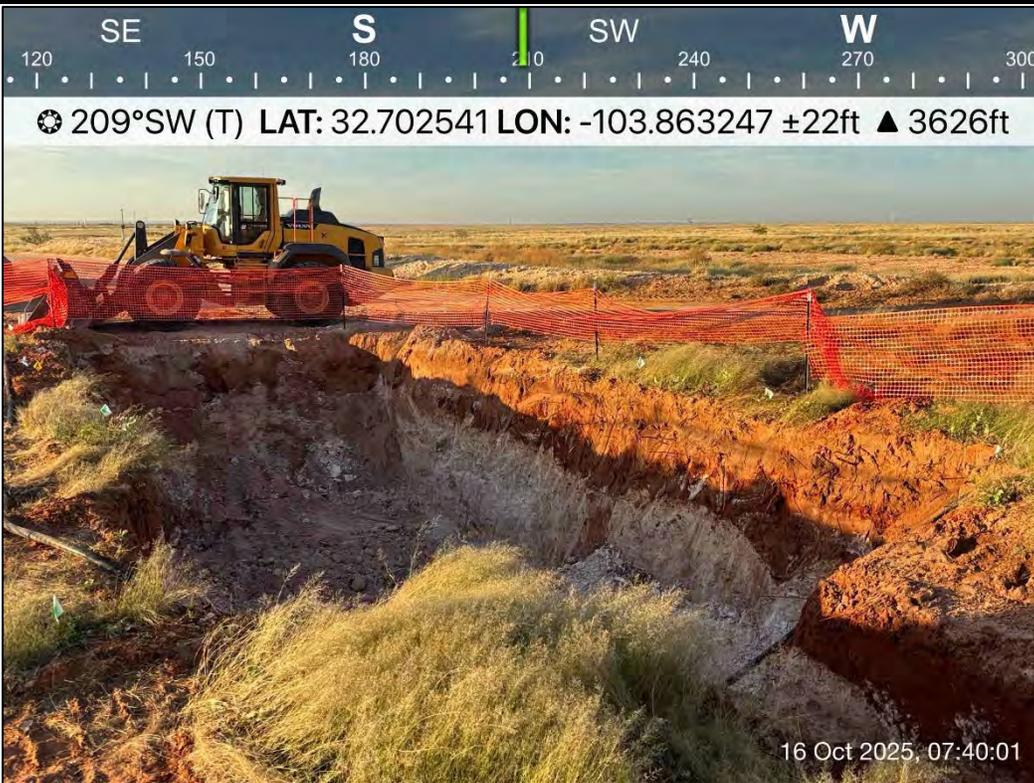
Southwestern view of excavation extent. 10/16/2025
